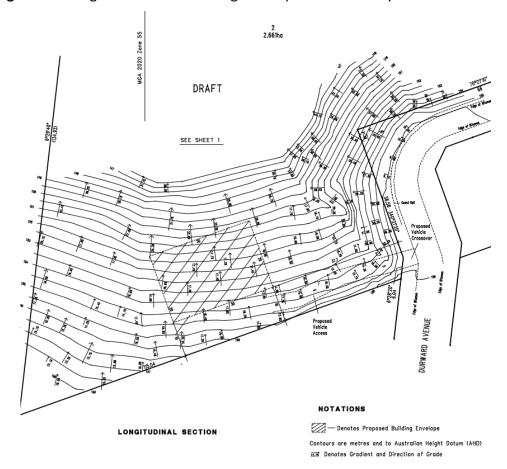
Enlargement of the Building Envelope and Driveway to Lot 2
